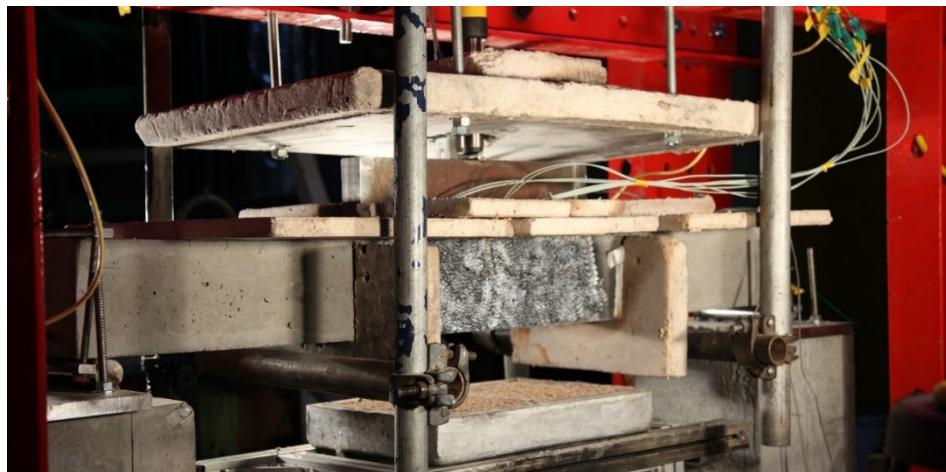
Photo showing Test Setup for Steel or FRP Reinforced Concrete Beams under Transient Localised Heating
